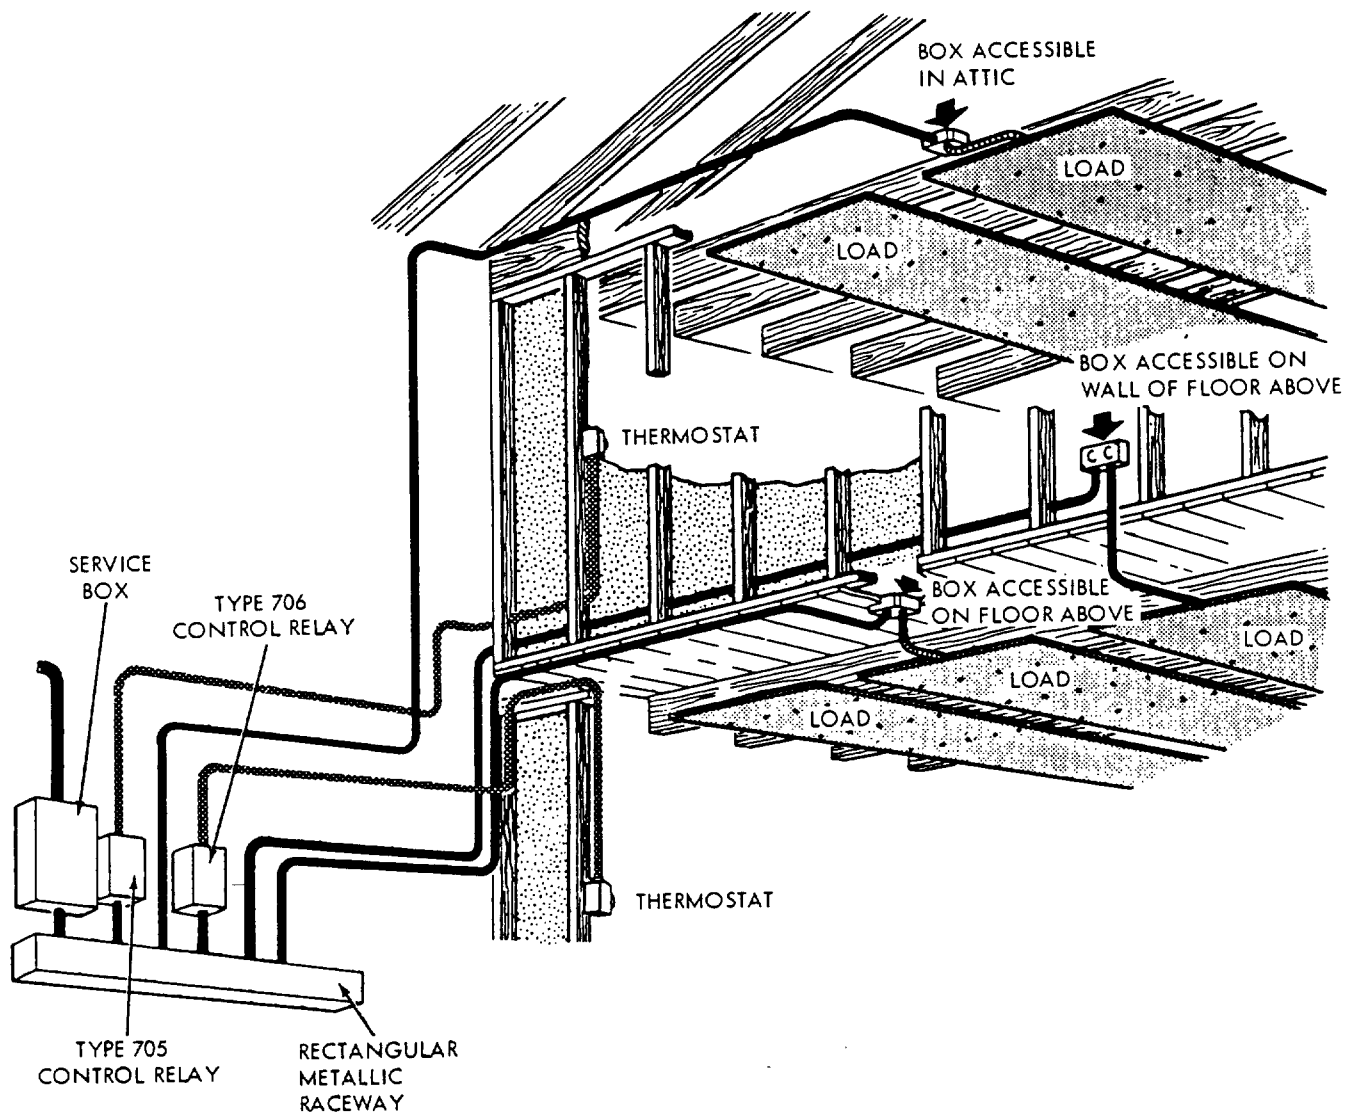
Typical Attic, Wall, and Floor Junction Box Installations
